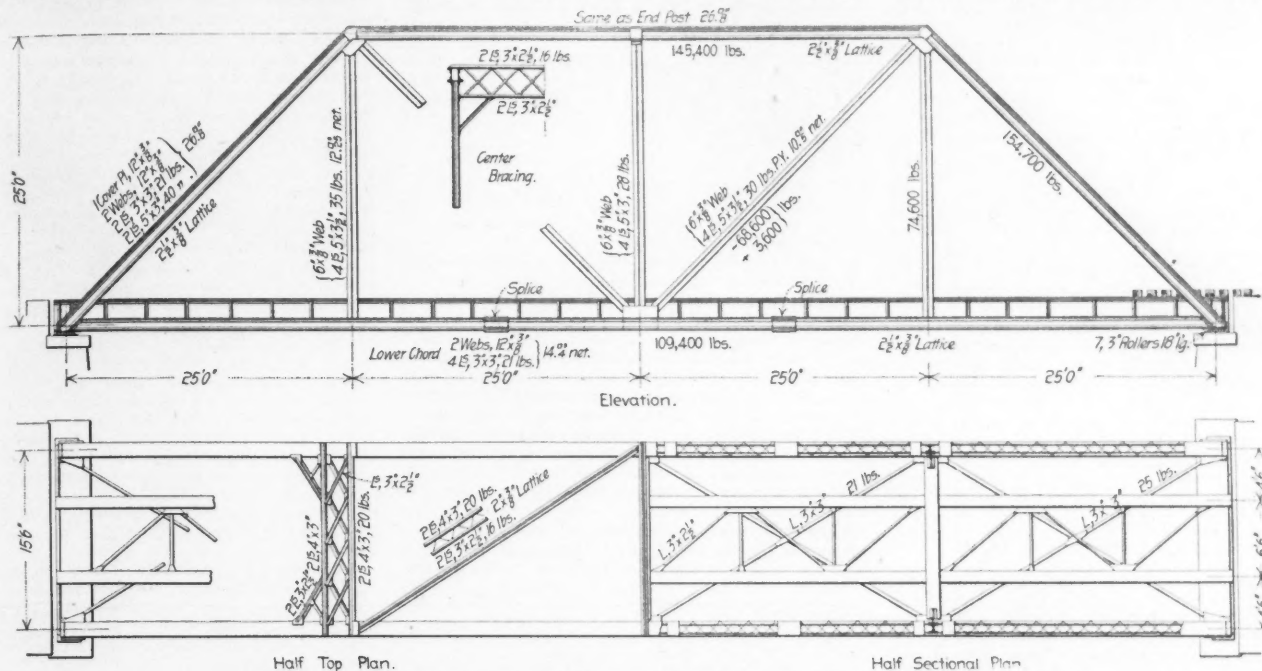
STEEL RIVETED TRUSS RAILWAY BRIDGE OF 100-FT. SPAN DESIGNED IN 1893.
